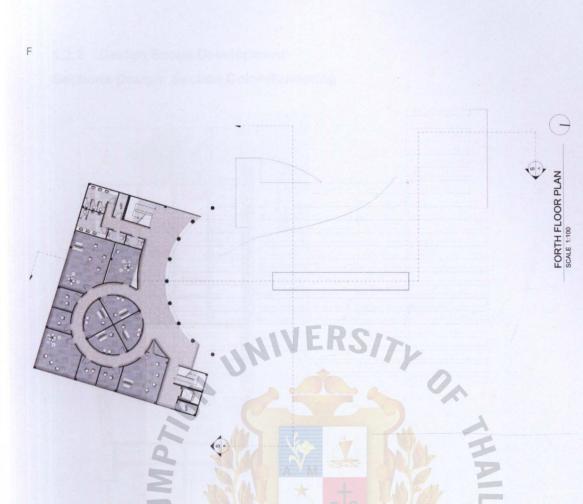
FORTH FLOOR FURNITURE LAYOUT PLAN
